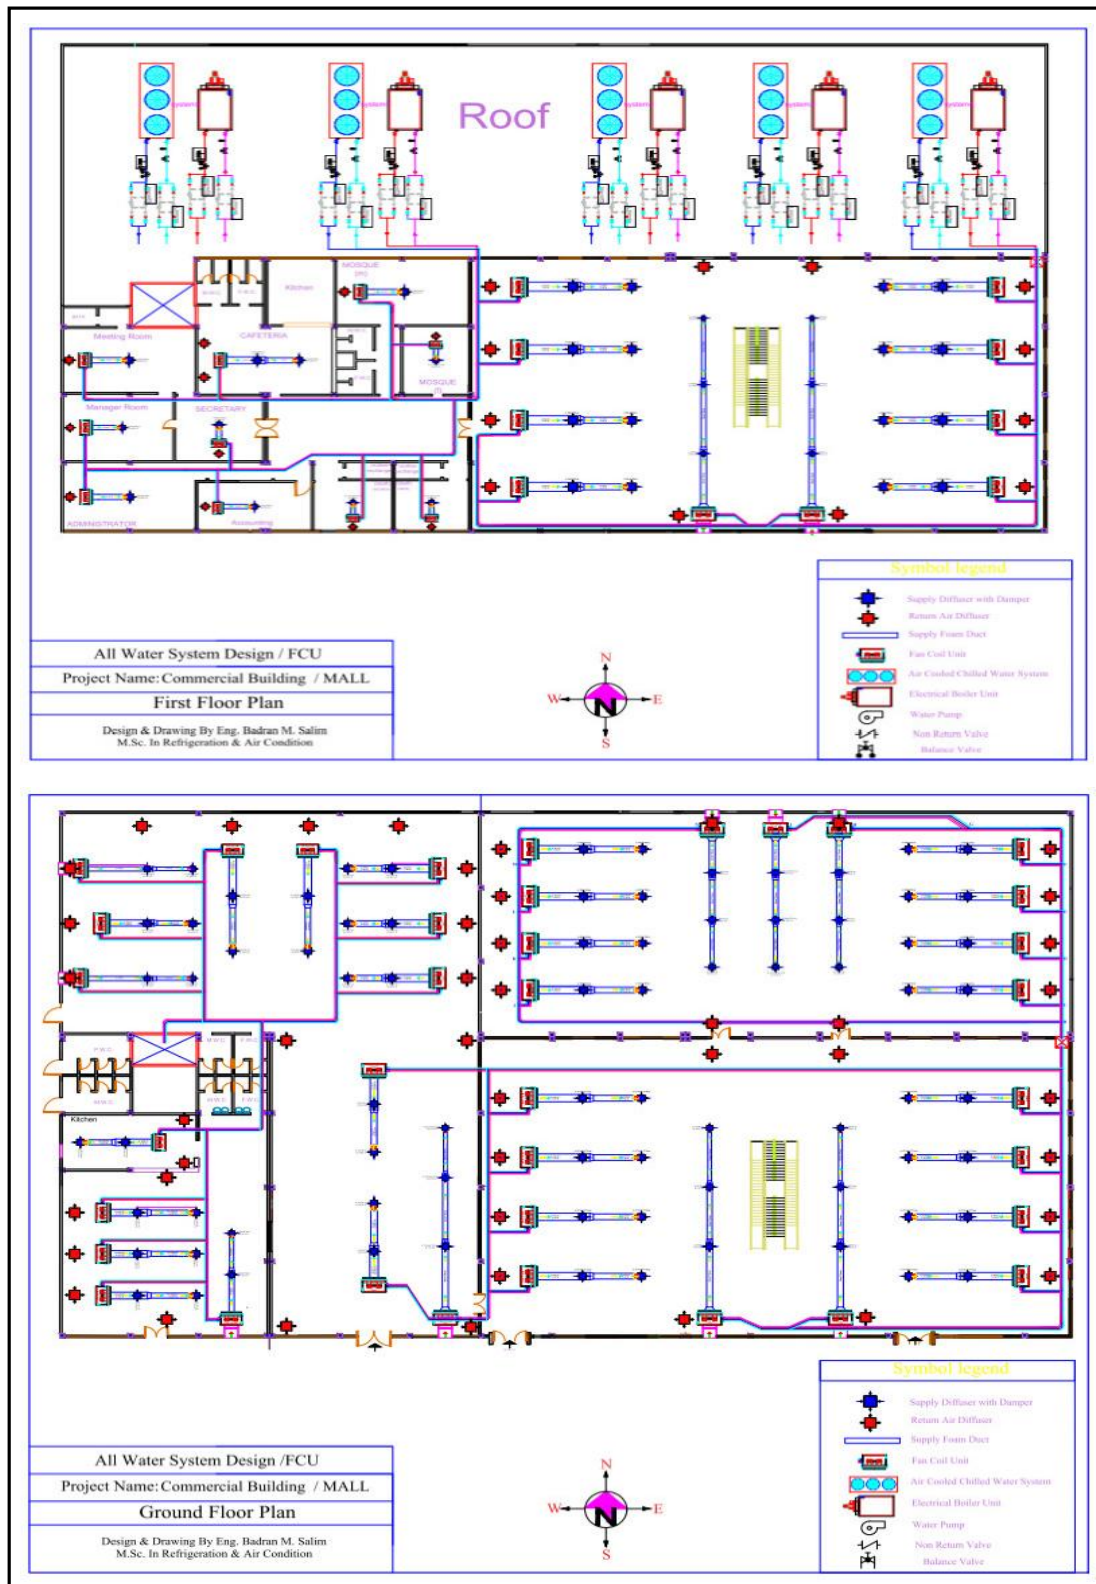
All Water A/C System Design and FCU Distribution for Ground and First Floors of Mall Building
